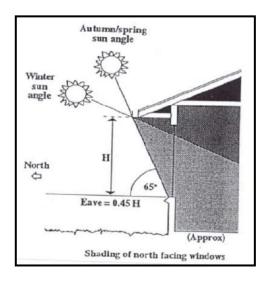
demonstrates the shading of north facing windows in buildings with optimum orientations. Eaves on north facing walls should be designed to completely shade windows in summer but allow the sun to shine through in winter. To calculate the distance the eaves should overhang, from the base of the window on an elevated plan, draw a line at 65°. shading the glass Methods for with awnings vegetation should be considered.
